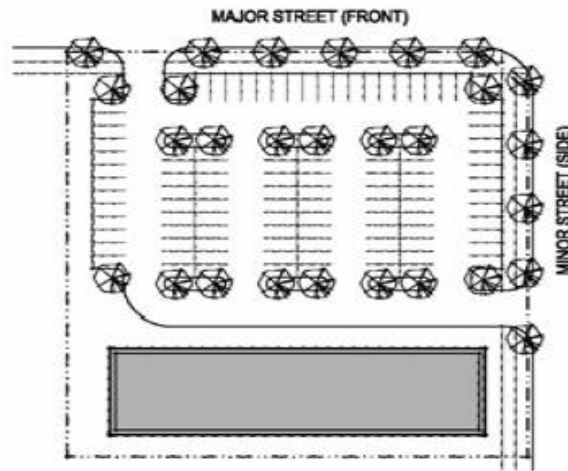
Example of parking permitted between a building (in front of building) and the right-of-way.
